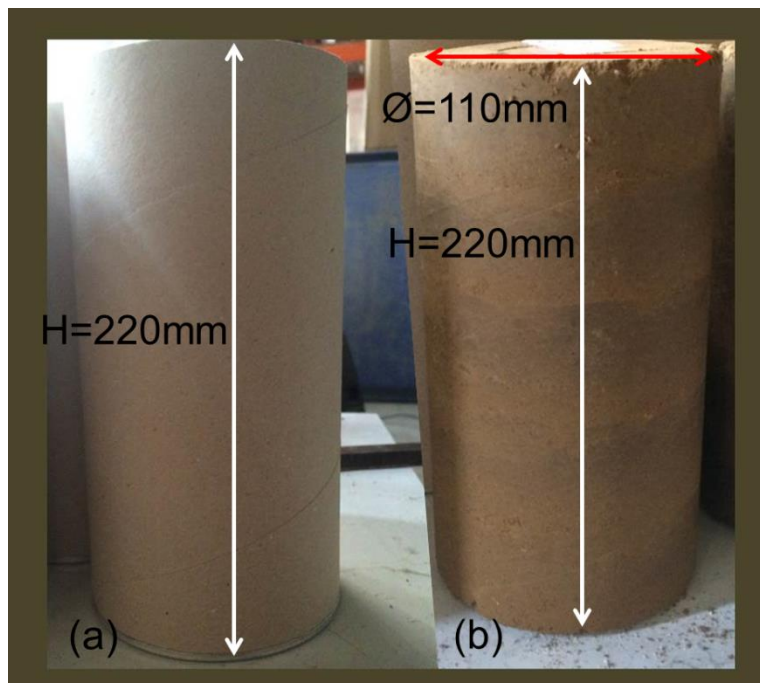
Small Cylinders of dimension 110mm (diameter) and 220mm (height), (a) Cylindrical cardboard tube (formwork), (b) Manufactured specimen
